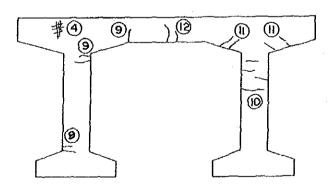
LOCATION & TYPE OF TYPICAL CRACKS IN SUBSTRUCTURE
